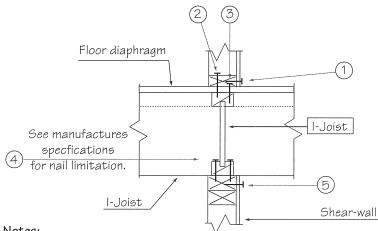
DETAIL F ~ SHEAR TRANSFER AT I-JOIST FLOOR OR RIM JOIST
